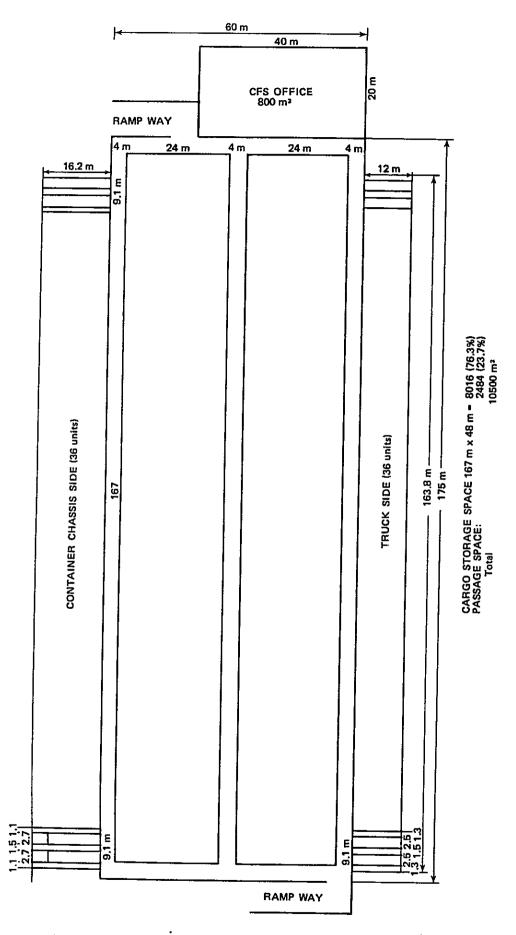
CONTAINER FREIGHT STATION ARRANGEMENT (Short Term Plan)
